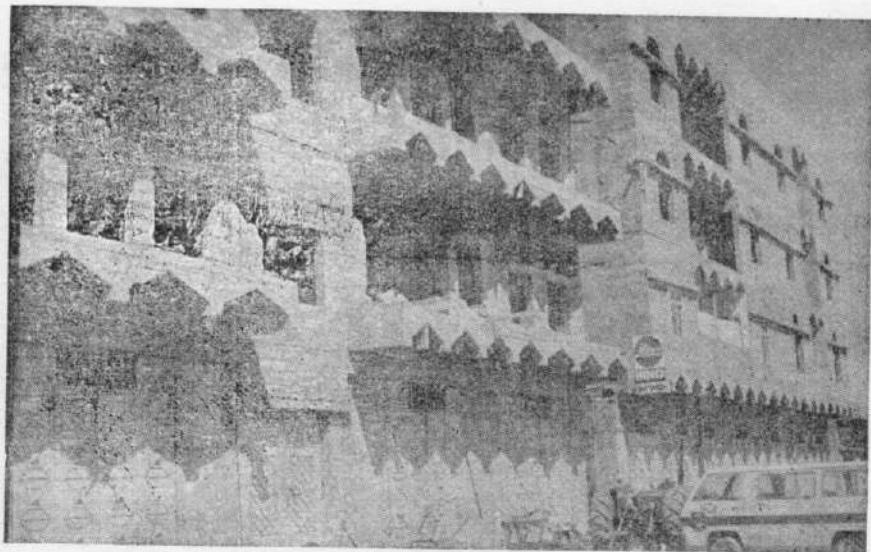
Reinforced concrete framed structures with concrete block wall filling in Dhamar, no damage reported. (Balcony wall filled with concrete block may fall in severe shaking, proper bonding and strength required.)
